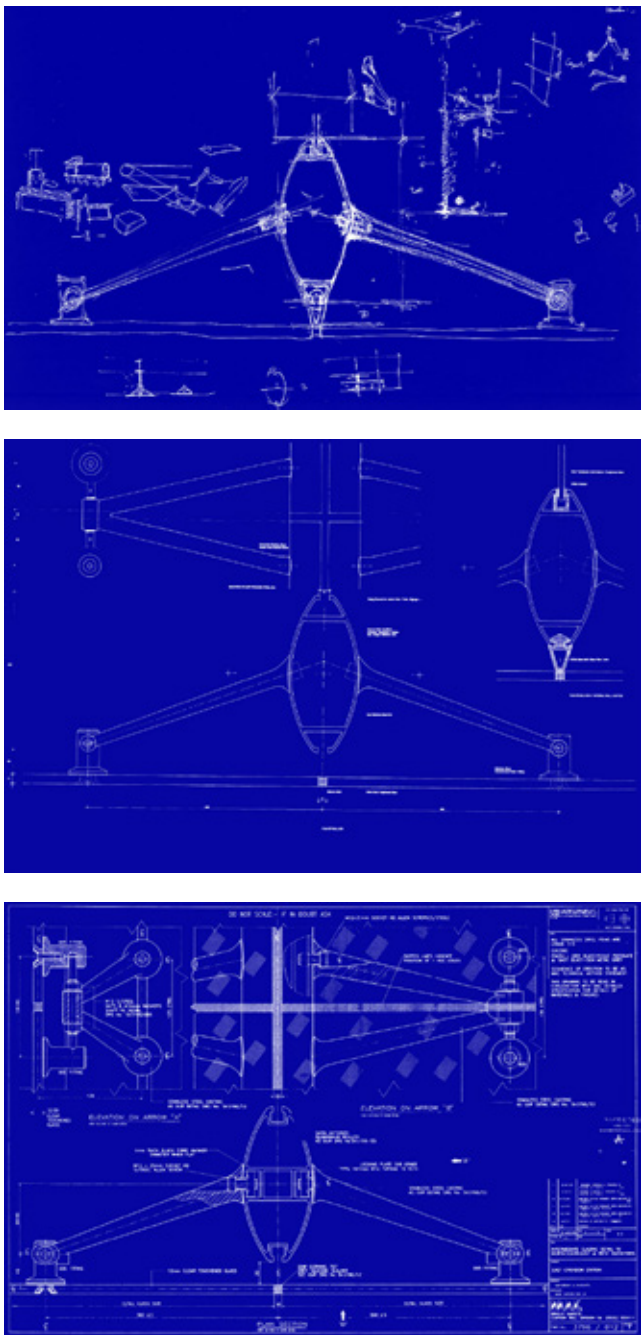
East Croydon mullion: author's initial sketch, Brookes Stacey Randall Fursdon's tender drawing and MAG's inspected shop drawing
